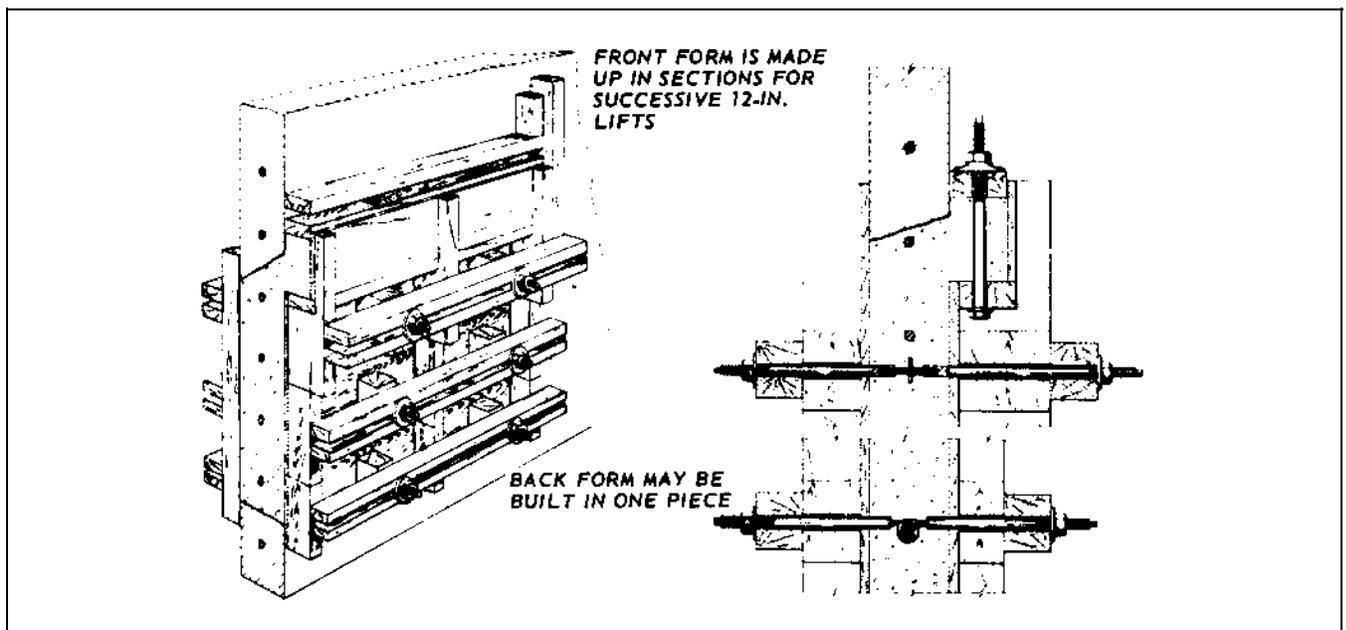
Detail of form for concrete replacement in walls after removal of all unsound concrete
